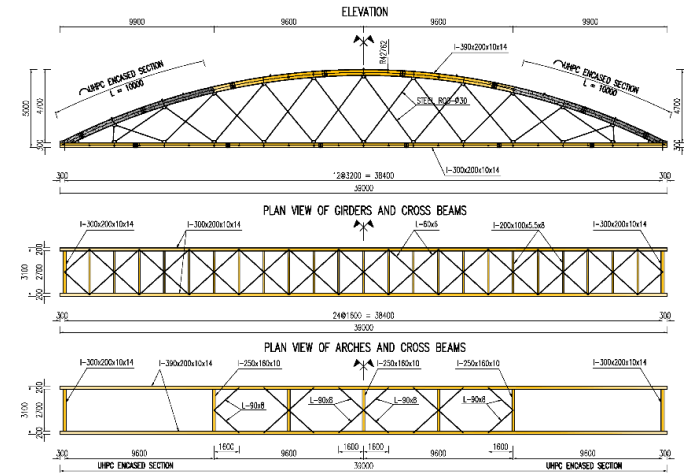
General arrangement of steel structures: arches, girders, and cross beams
